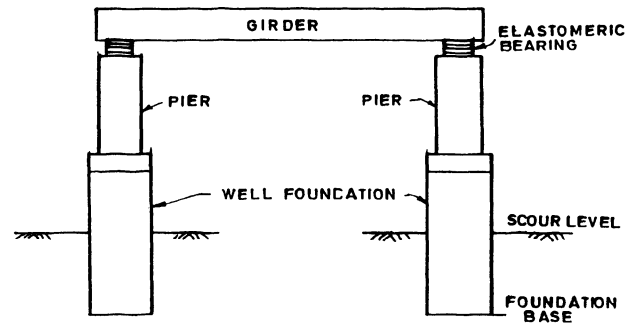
SINGLE SPAN BRIDGE ON ELASTOMERIC BEARINGS
